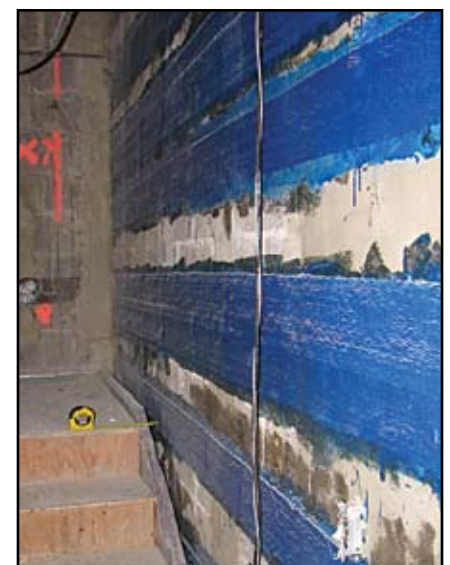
Shear strengthening of CMU Walls with GFRP laminates due to construction errors in Princeton, NJ. Original shear reinforcement in several locations of the wall was either omitted or placed too far apart.
